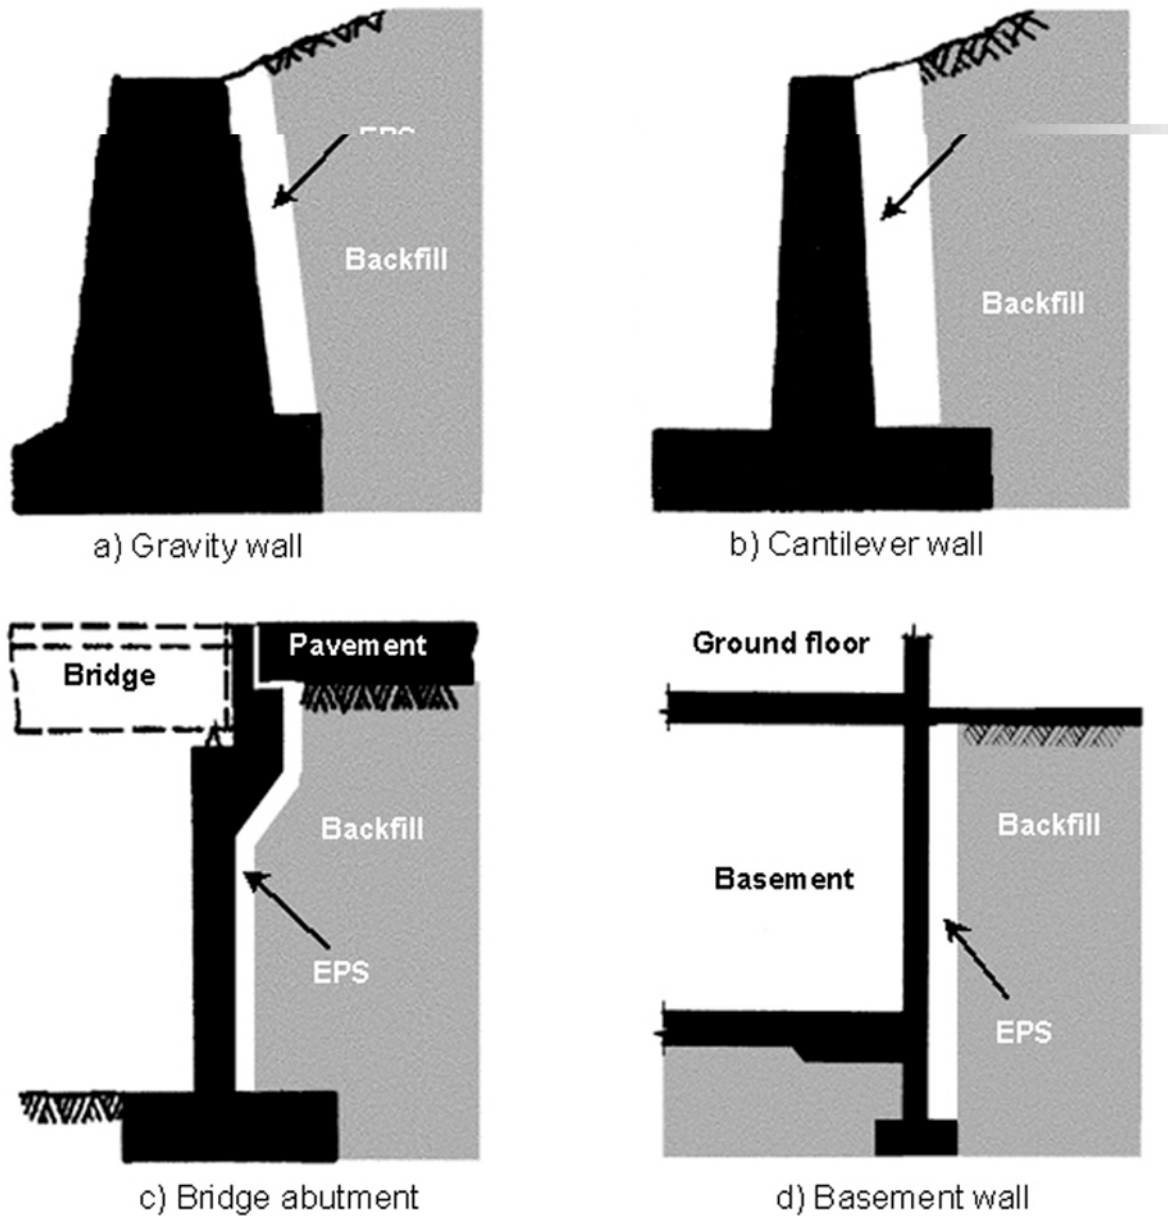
Earth retaining walls protected against seismic earth pressures by an EPS geof foam layer installed between the back face of wall and the backfill material.
